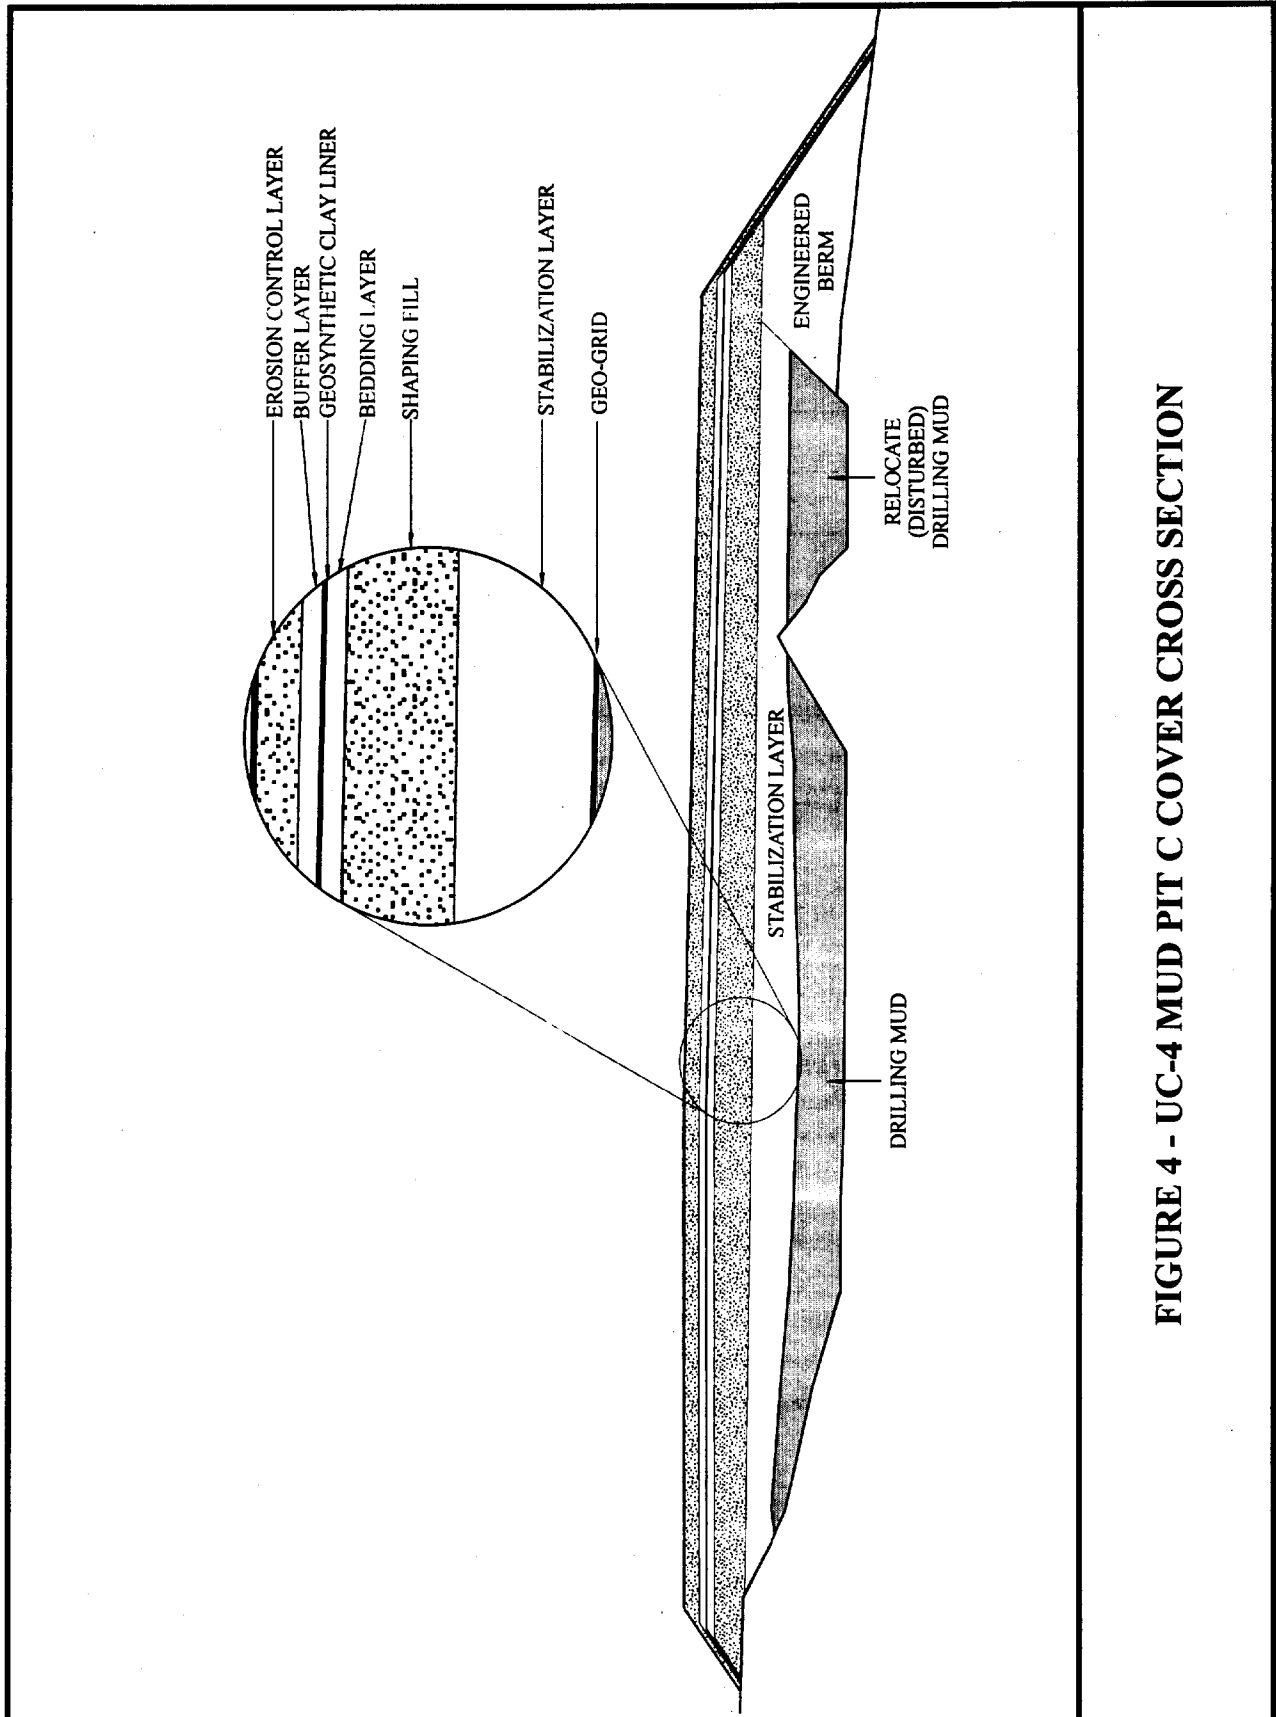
UC-4 MUD PIT C COVER CROSS SECTION
